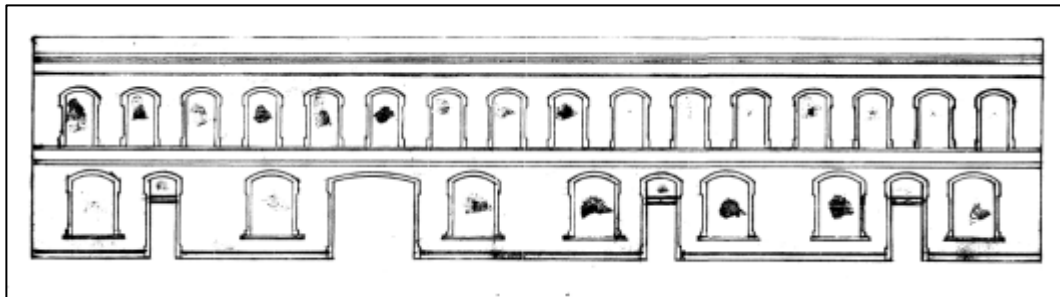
1907 plans showing the building façade along Castle Street built between 1907 and 1910 on Sections 72 and 73 (DCC Archive).
